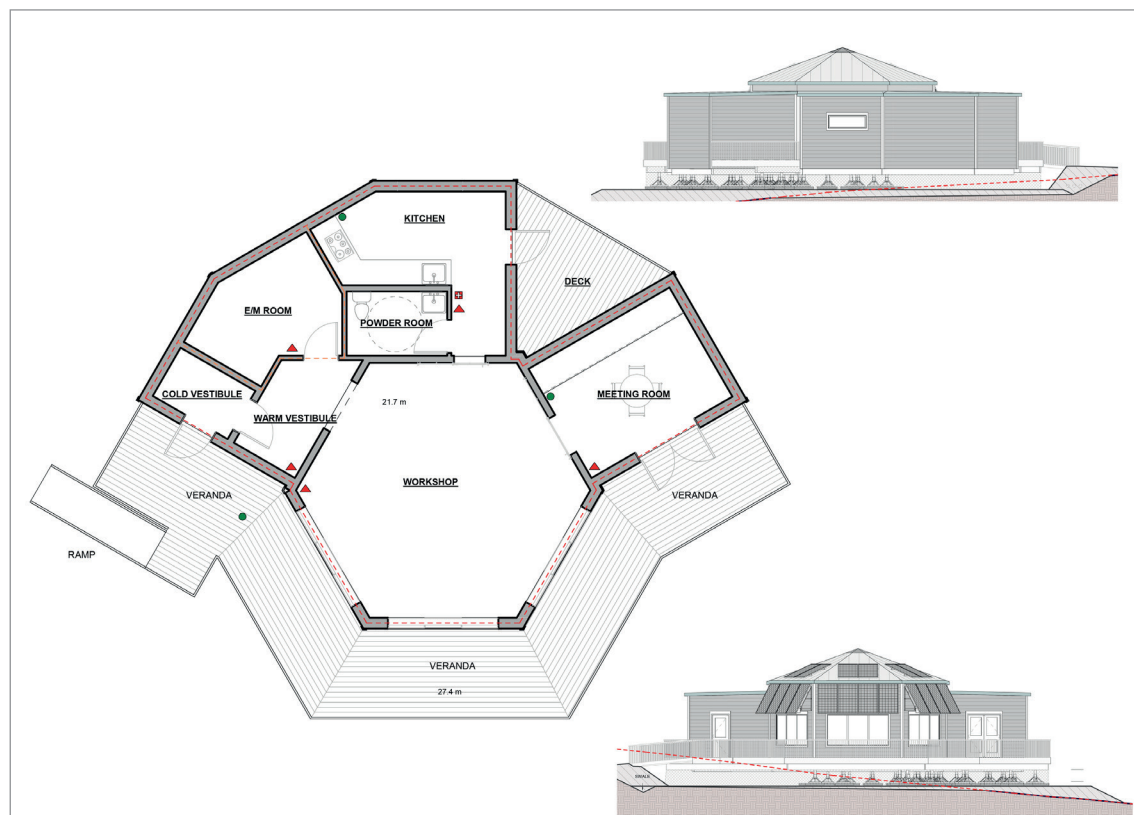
SUBSEQUENT DRAFT DESIGN SHOWING THE FLOOR PLAN AND PROFILE OF THE BUILDING WHEN OPTIMIZED FOR ENERGY EFFICIENCY. | PI/KHS AND SAIT GBTAC BUILDING PLANS AND BLUEPRINTS. ON FILE AT PI/KHS ARCHIVES.
